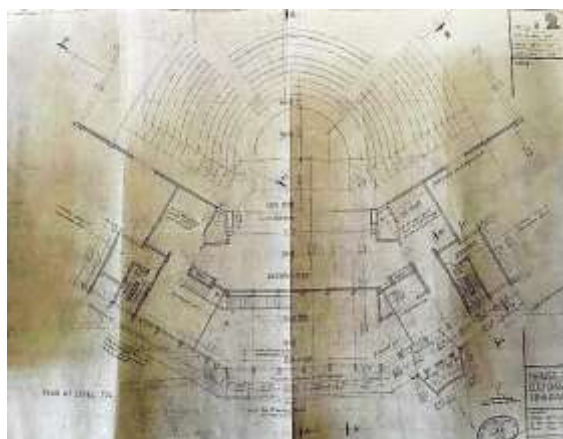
Ground Floor plan of the Cultural Centre, Mokola (Source: Author, 2025).
